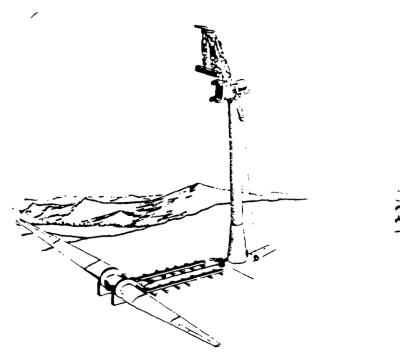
Skid Rotor from Assembly Area to Base of Tower
